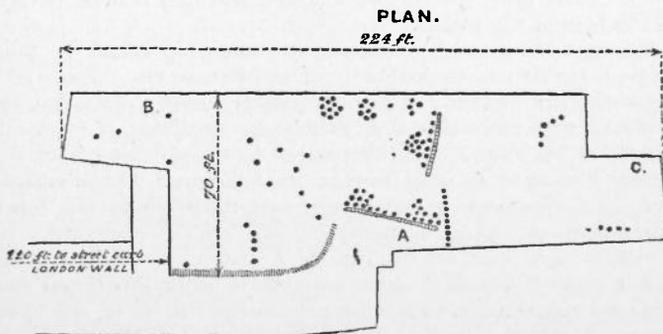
PLAN OF PILE STRUCTURES NOTED BY GEN. PITT-RIVERS IN 1866.
